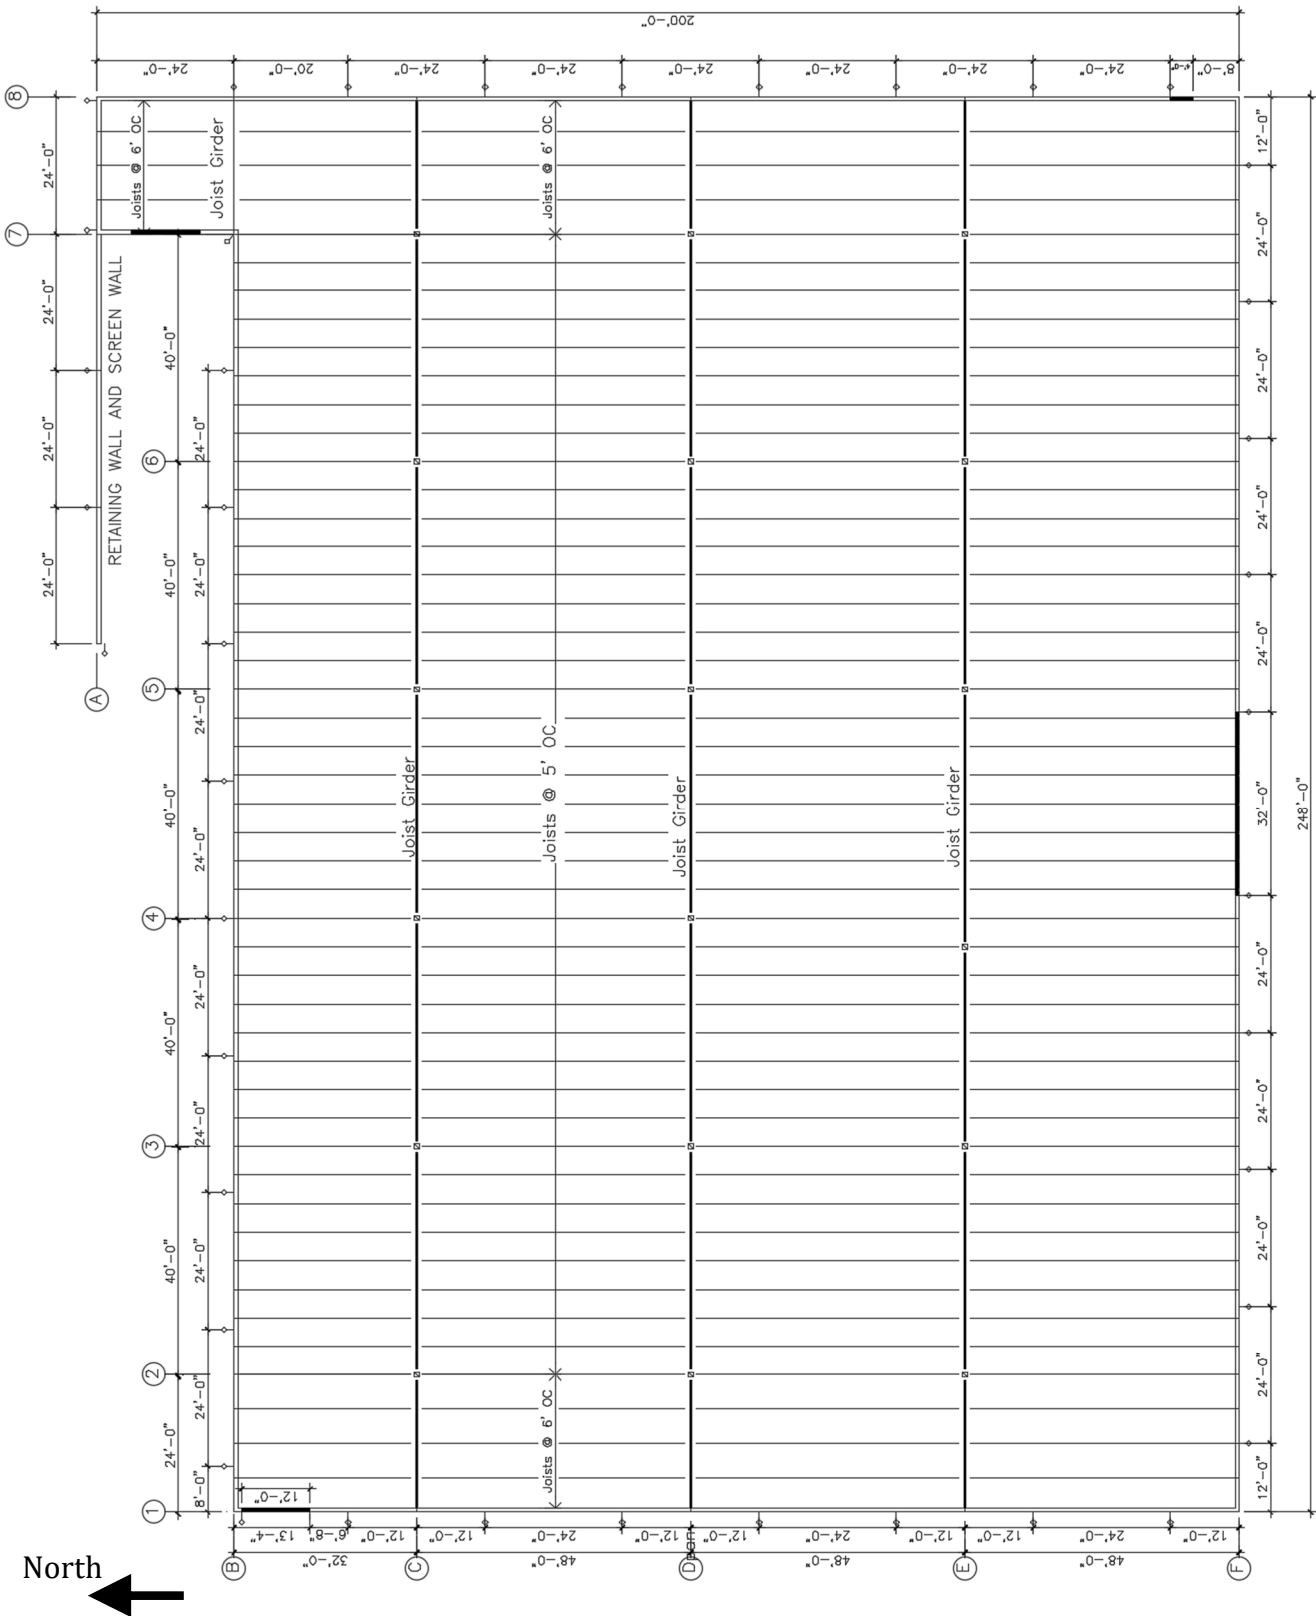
JHM Box Building Roof Framing Plan and Layout
